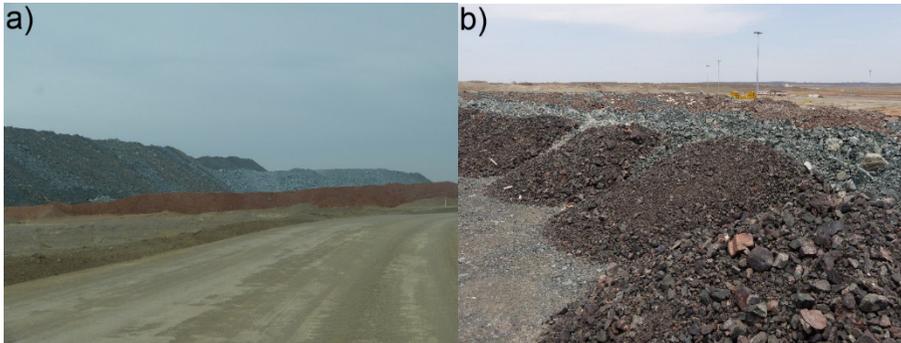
(a) Waste rock piles and (b) excavated rock piles.
